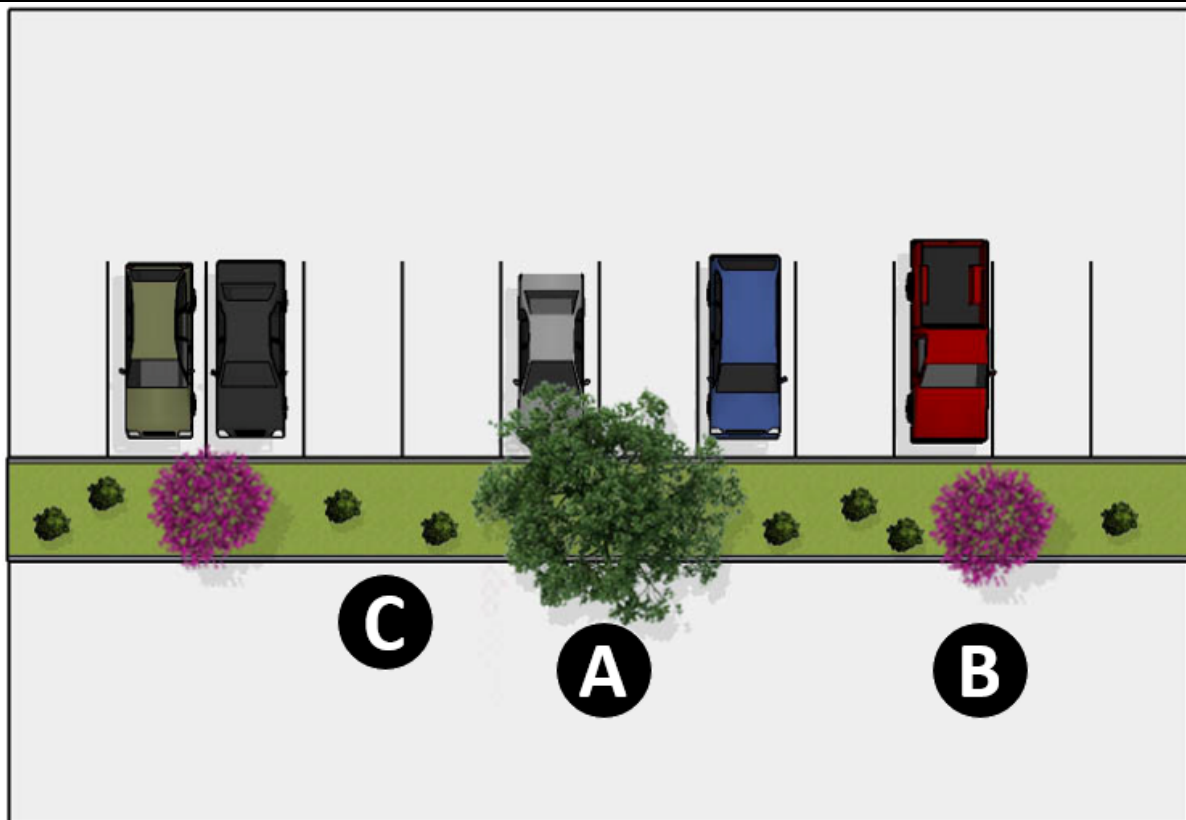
, Parking Lot Yard Planting Standards per 100 Linear Feet
